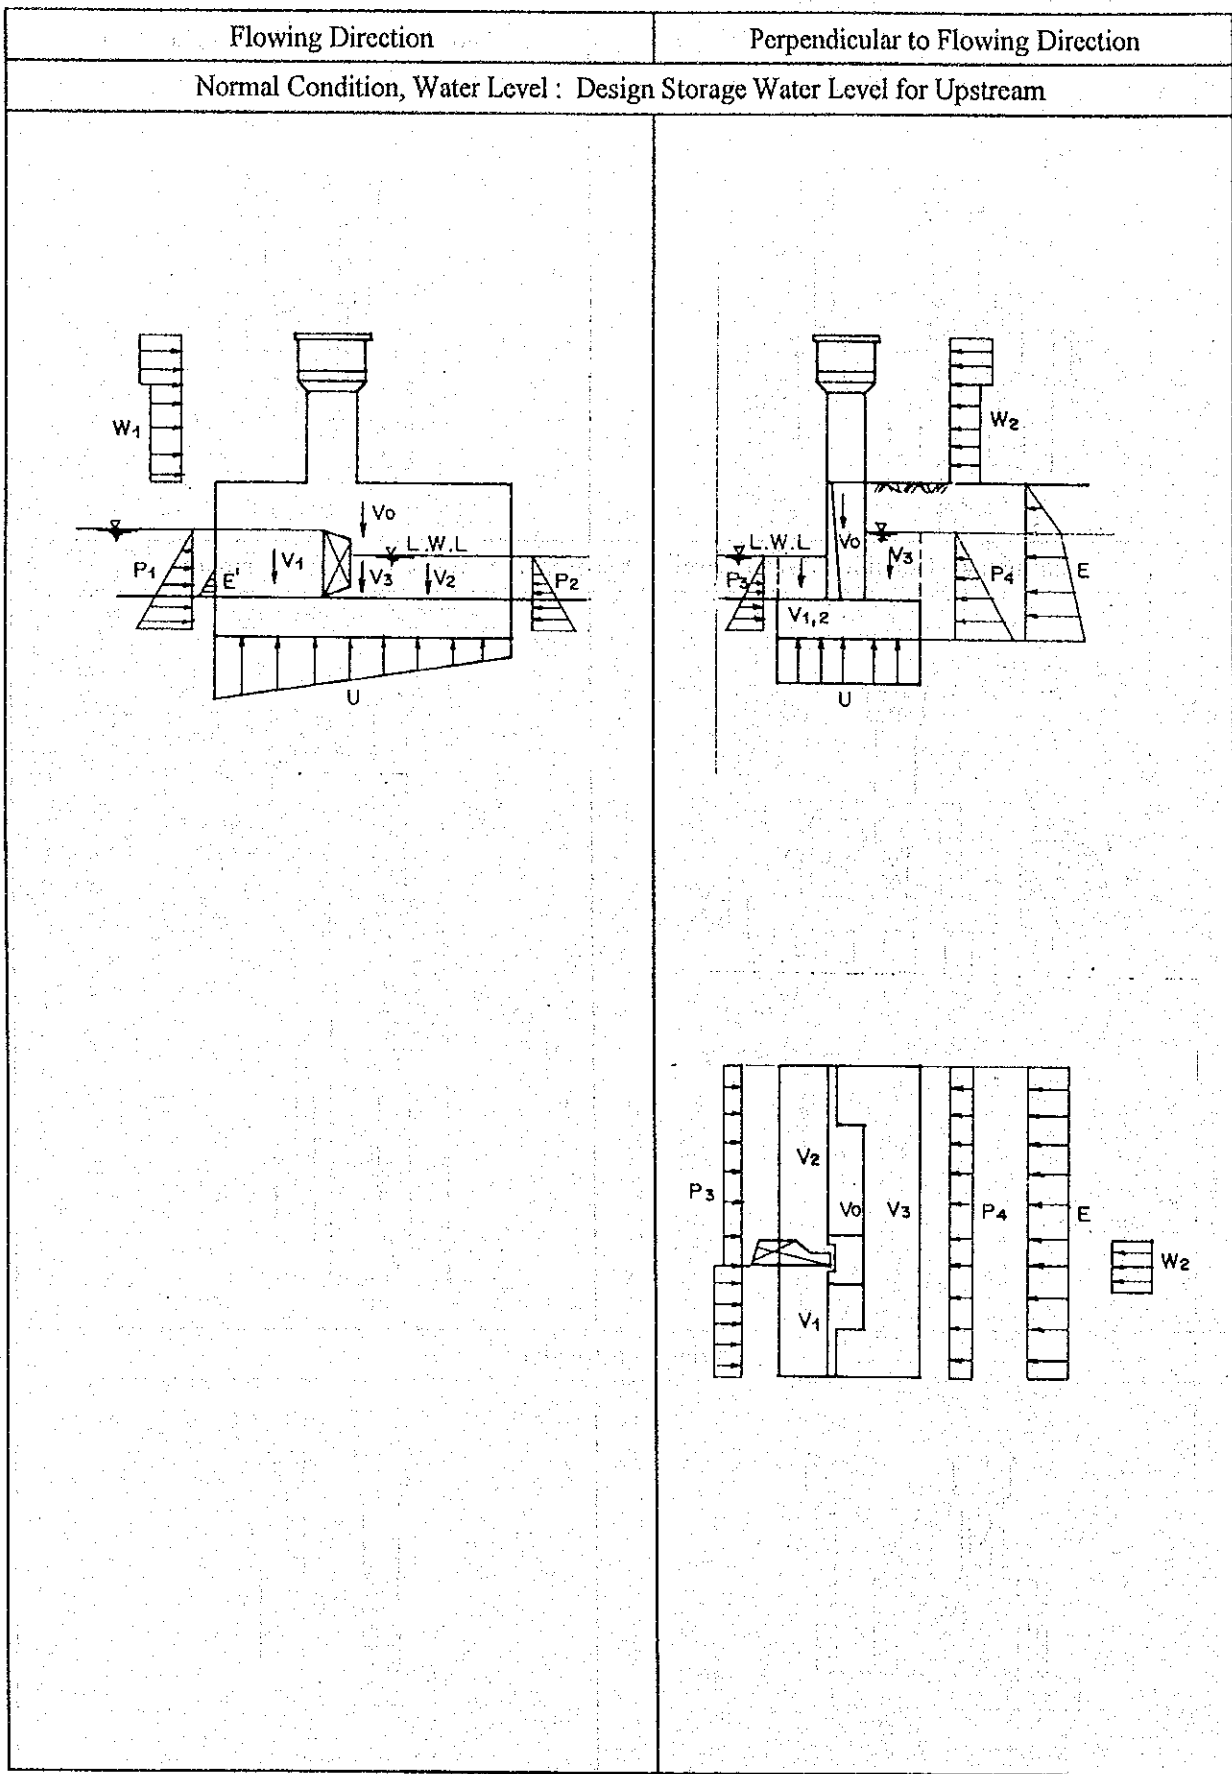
(1/4) Loading Conditions for Side Piers of Weir
